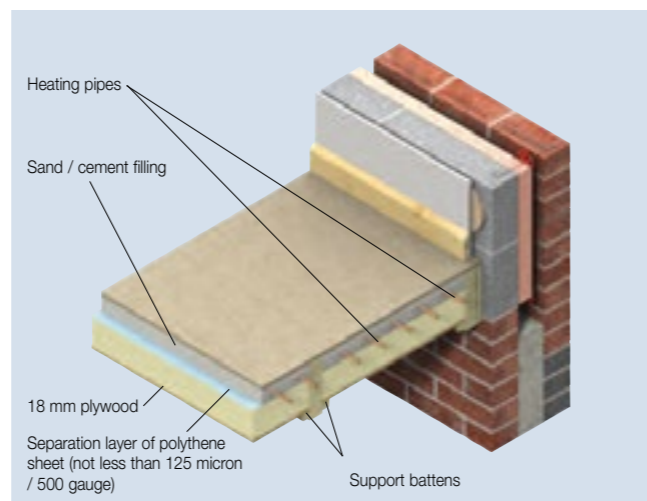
Intermittent Heating Applications – Suspended Timber Floor
